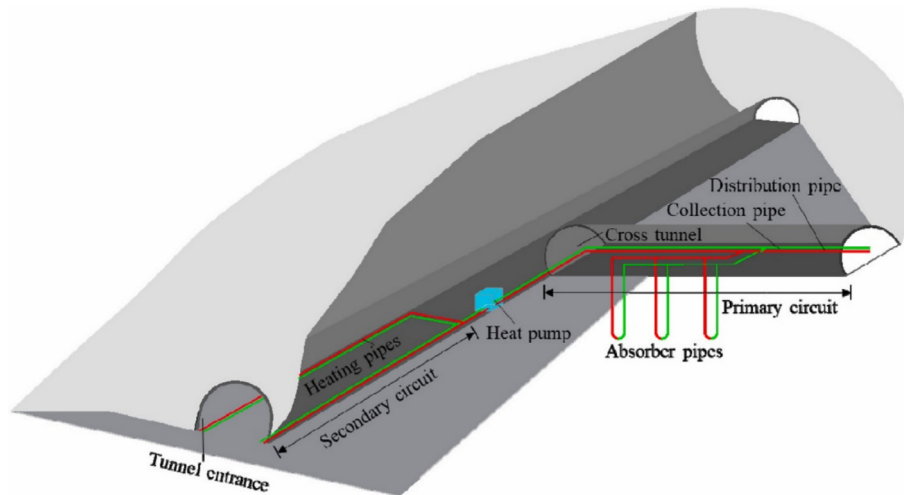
Schematic of tunnel drainage system based on ground heat exchangers (Y. Zhang et al., 2022).
